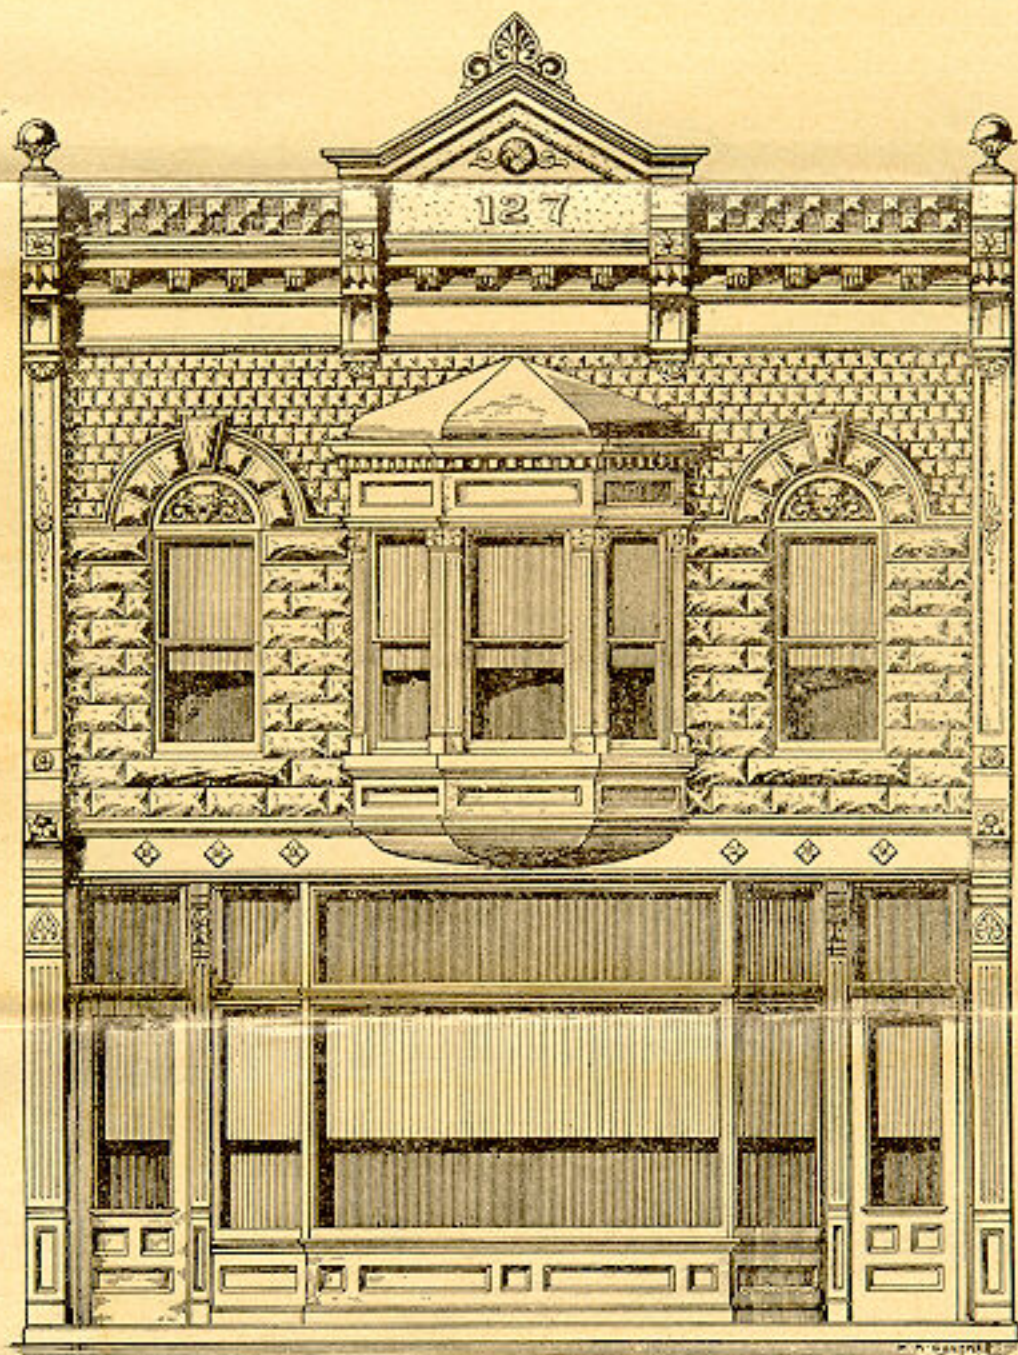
GALVANIZED IRON AND COPPER BUILDING FRONTS.
